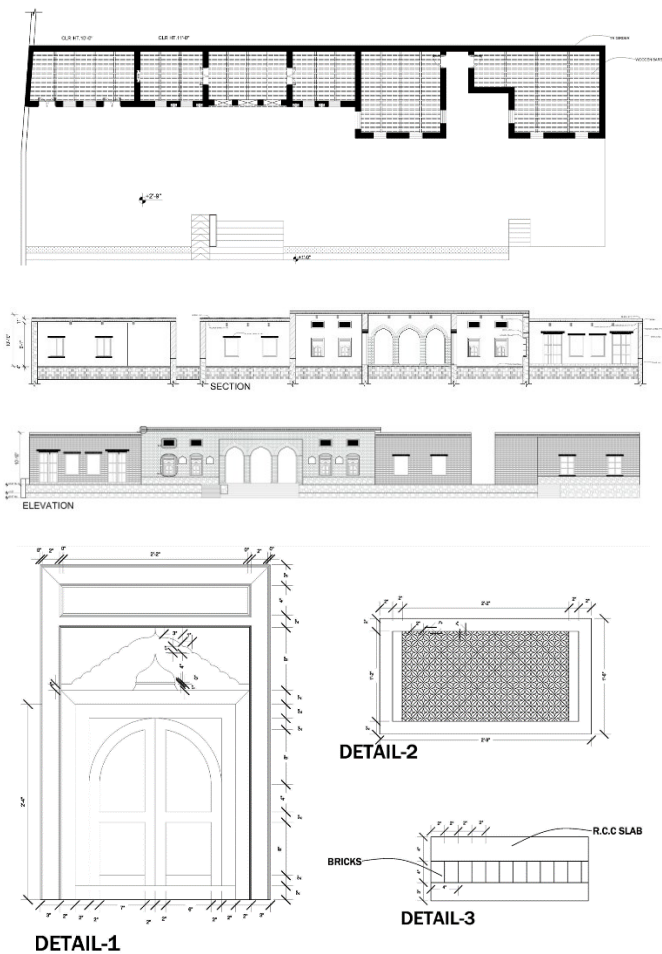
Haveli: Top: Plan. Middle: Section with details and front elevation of Haveli. Below: Details, (Source: Ramsha Nazir Malik)
